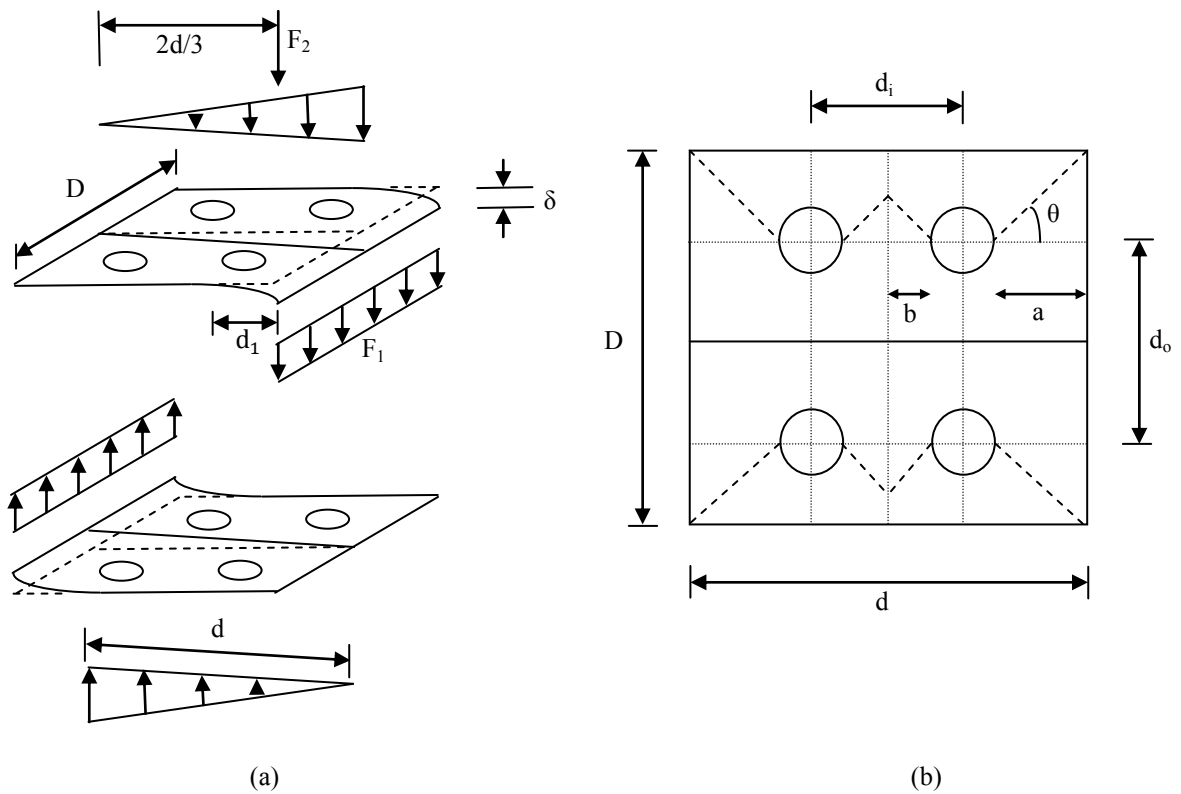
(a) Deformation of bolted flanges, (b) Dimensions of bolted flange.
